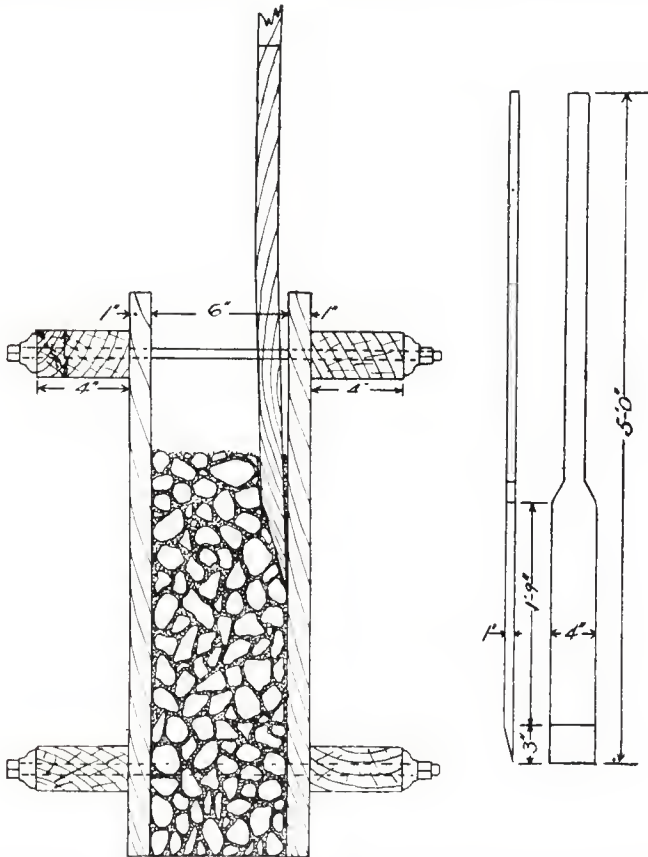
Spading Thin 6-Inch Concrete Wall and Cut of Wooden Spading Tool.
